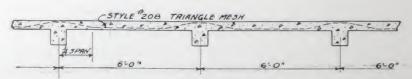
Section through beam and slabs showing typical mesh design for slabs.
